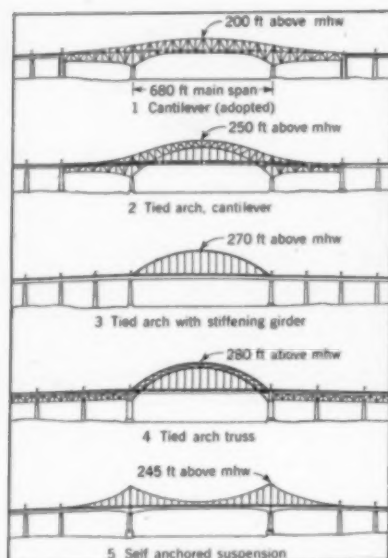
STUDIES OF FIVE BRIDGE TYPES resulted in adoption of cantilever for economy, appearance, and ease of erection without falsework. Tunnel crossing was found more expensive than bridge crossing.
